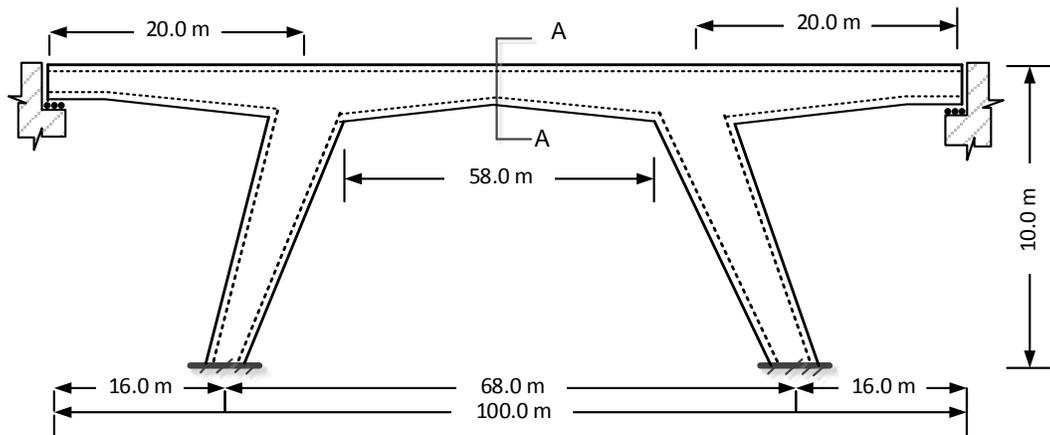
(a) Precast Prestressed Concrete Frame Bridge
